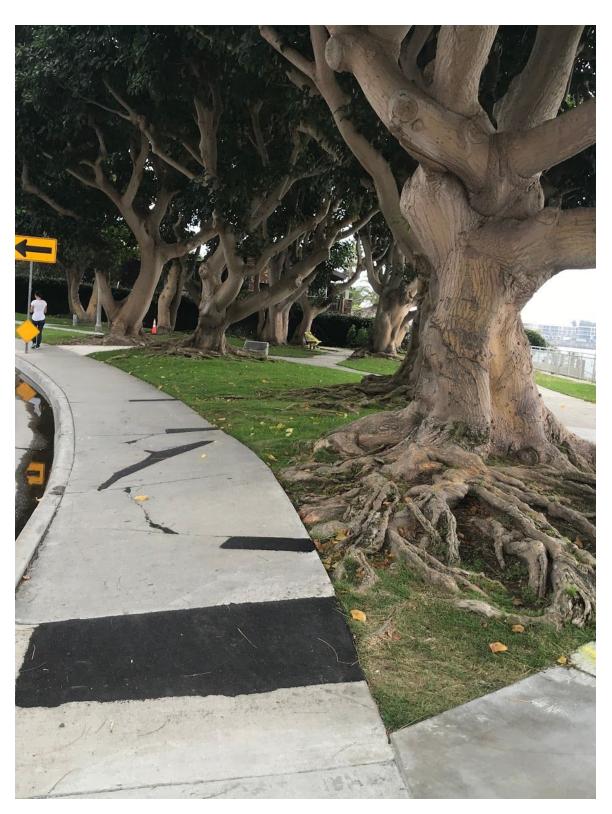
Tree VM-28, Large structural roots (>2") being pruned for new construction to sidewalk.
